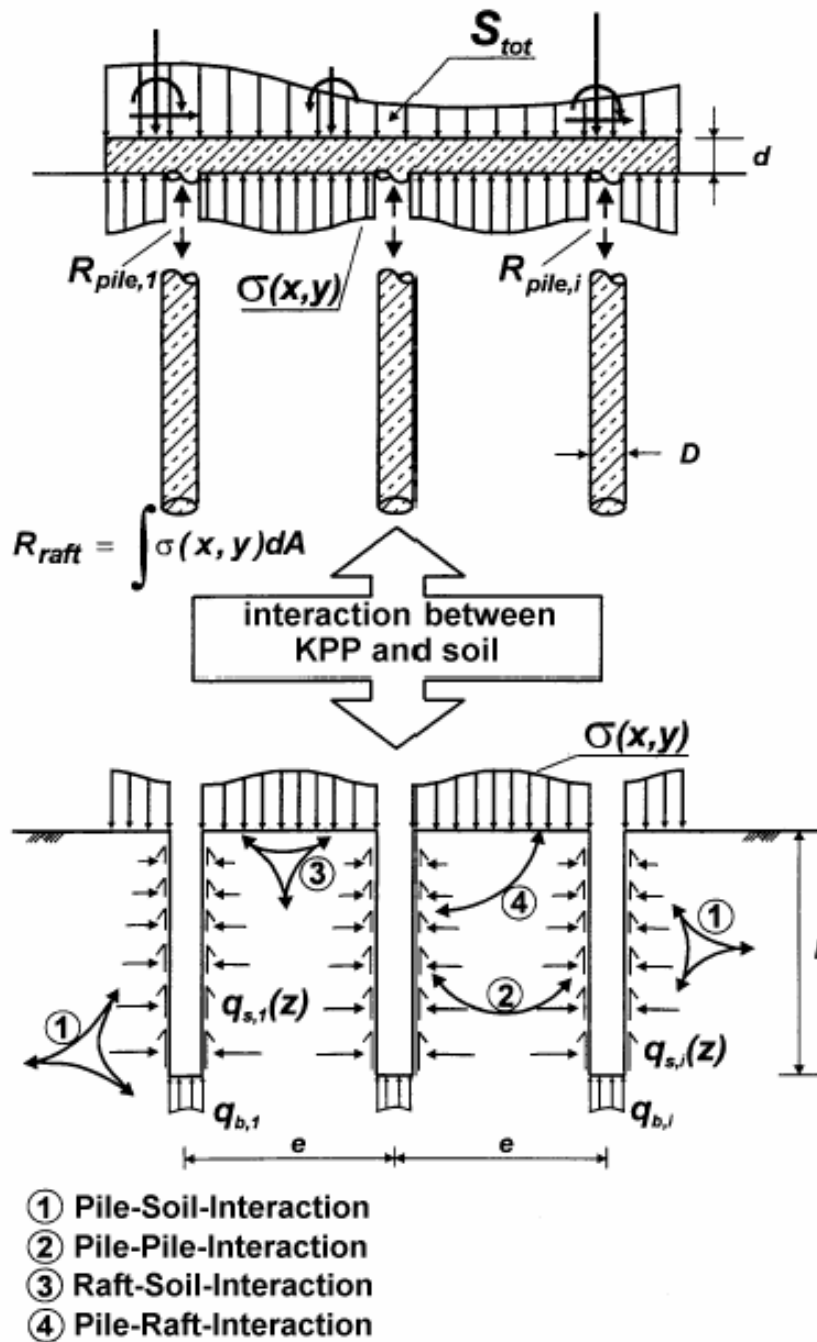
Piled raft foundation as composite construction of the bearing elements piles, raft and subsoil (Poulos, 2000)
